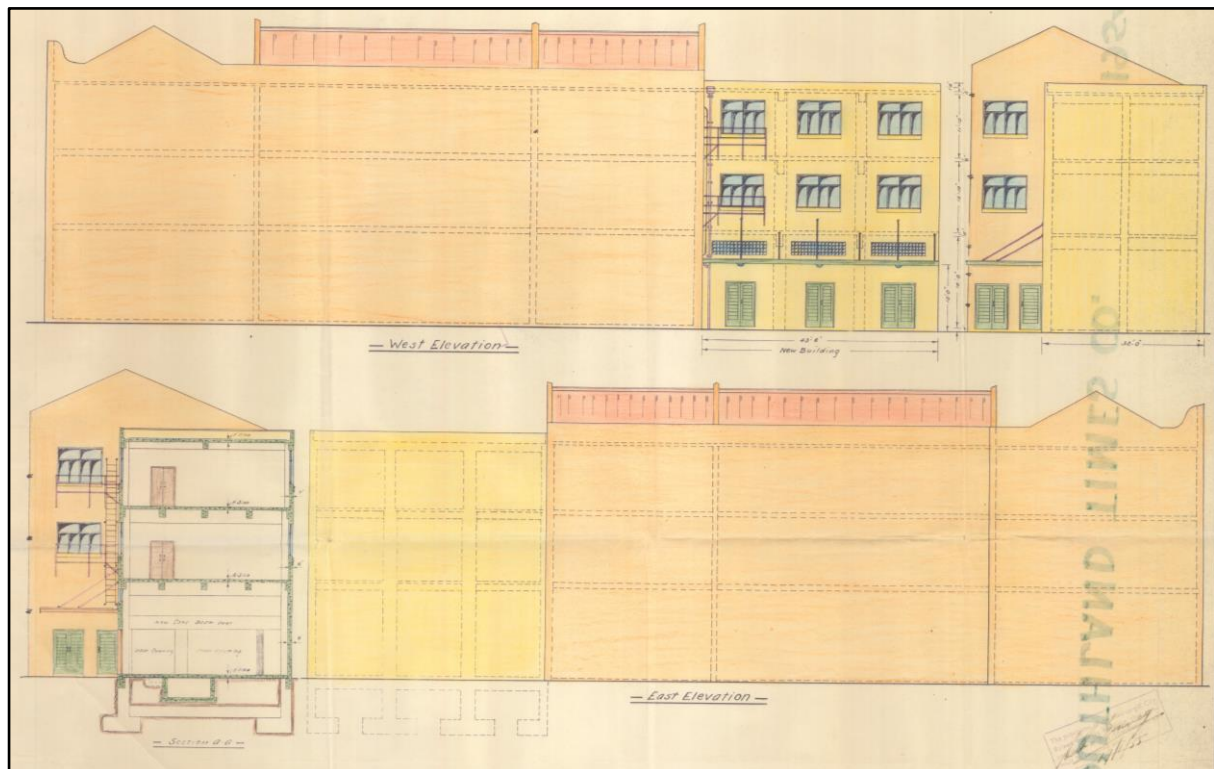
Detail from 1954 plan of Southland Times Building, showing the addition of new office space at the rear of the original building (Blick, 1954).
